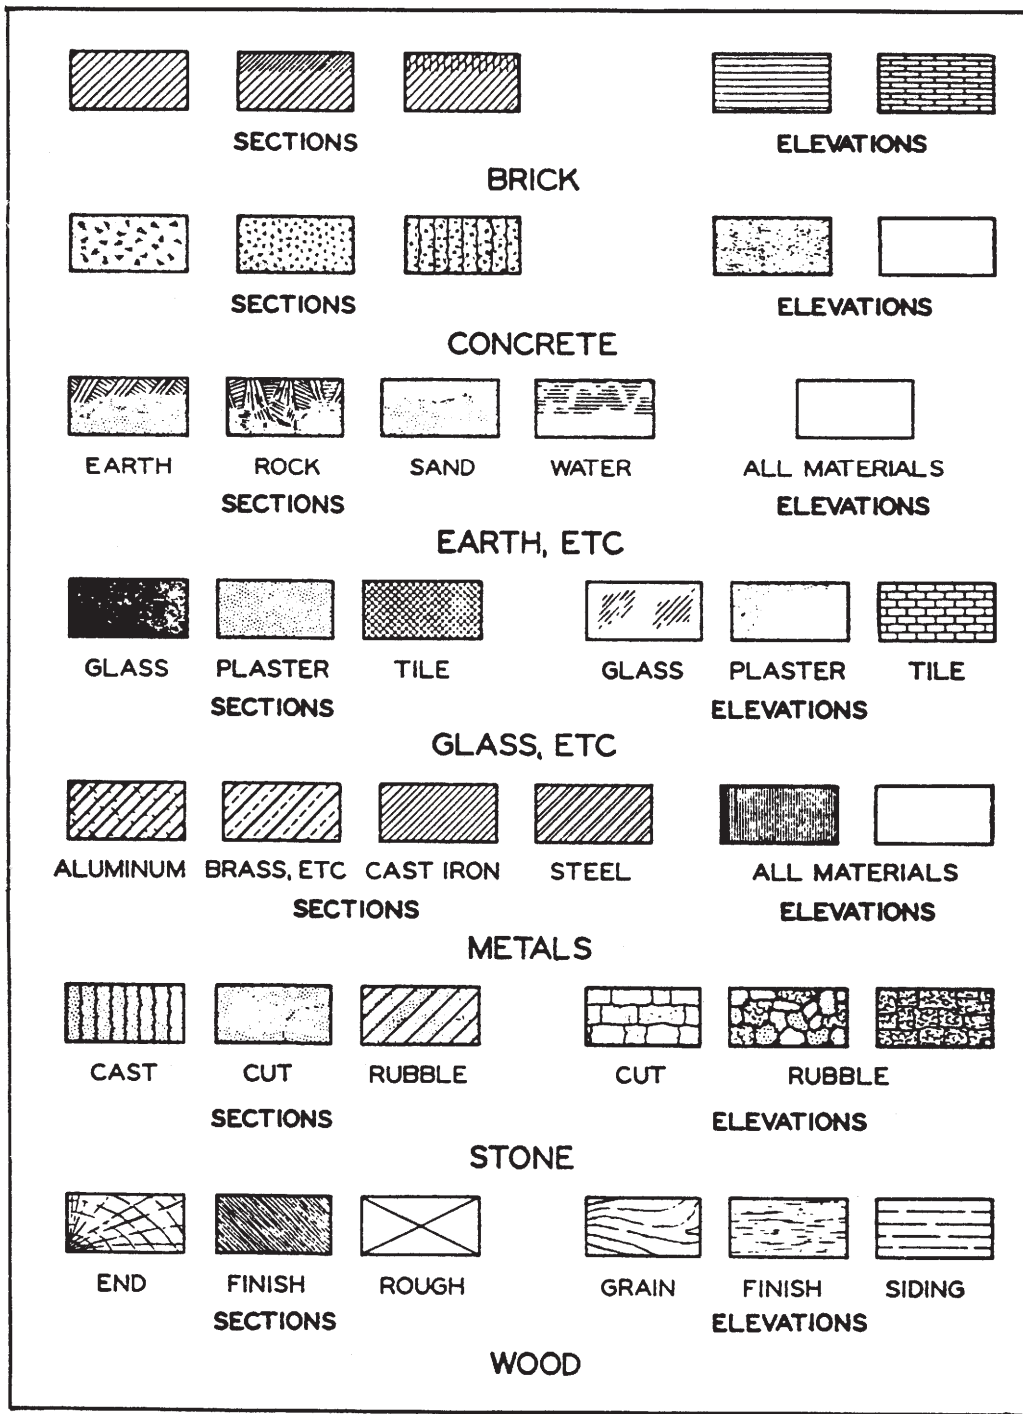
Common architectural symbols (for various materials) used in drawing sections and elevations.
